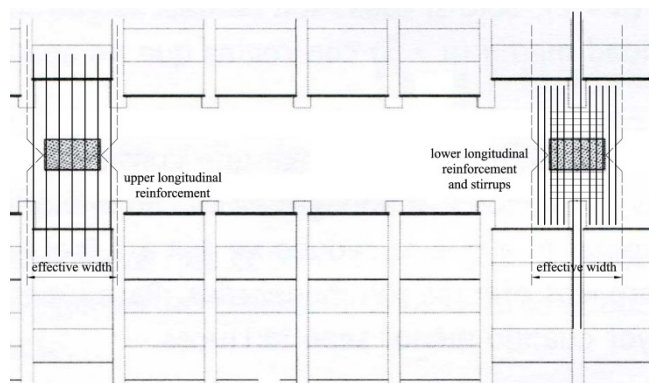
Suitable arrangement of reinforcement within effective width in joists-column connections
